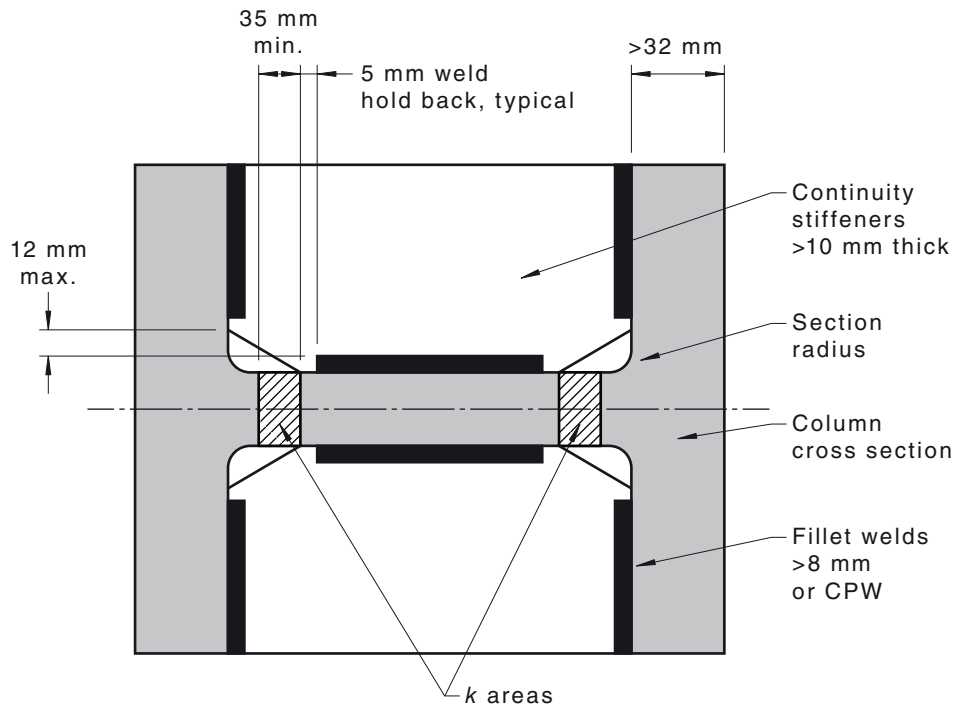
WELDING OF CONTINUITY STIFFENERS IN SEISMIC MEMBERS
